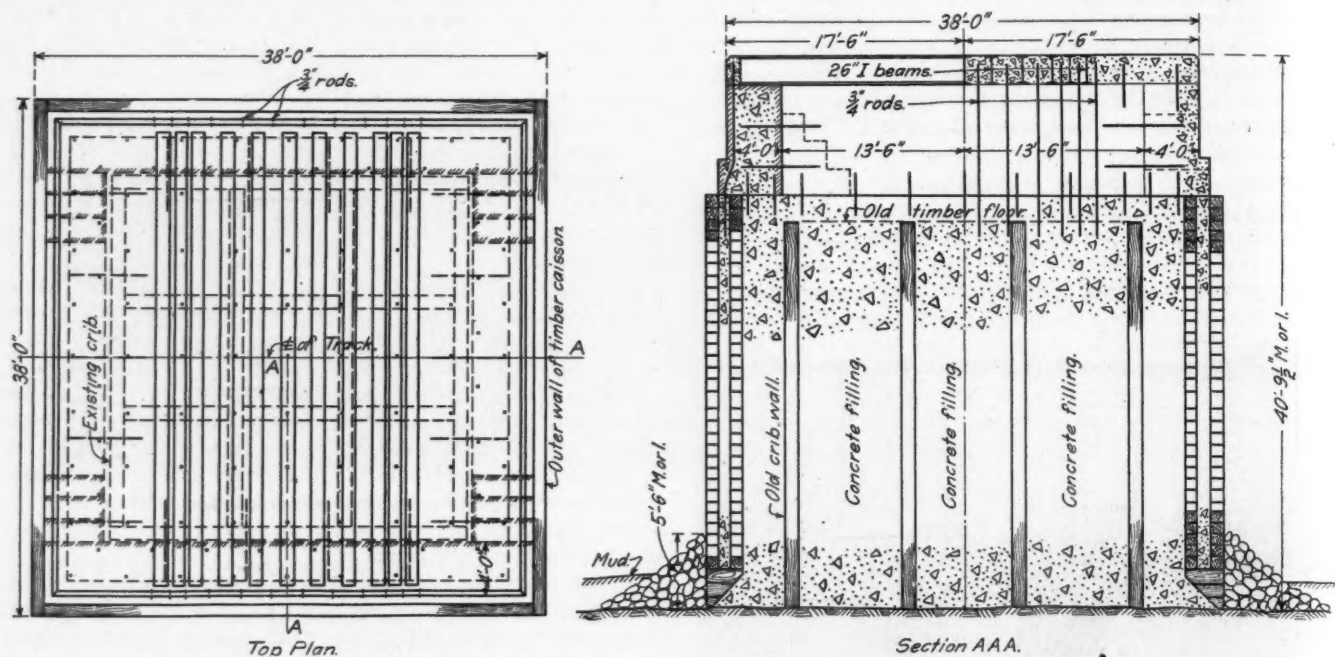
Plan and Section of Caisson for Center Pier of Richelieu River Bridge.
